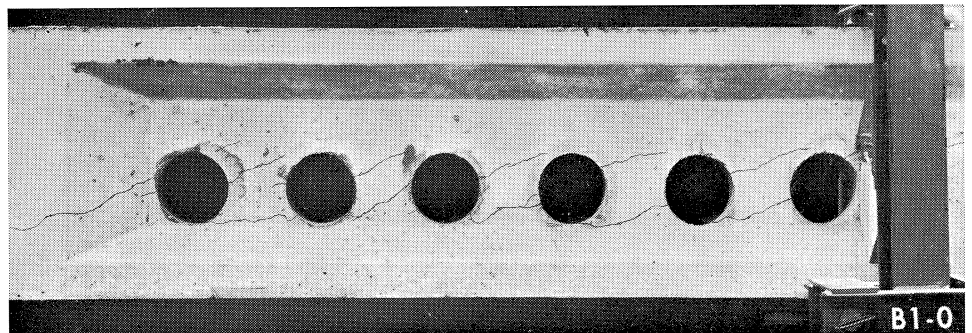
End region of a prestressed beam (see Fig. 66) provided with six holes, here shown after being loaded to failure.
